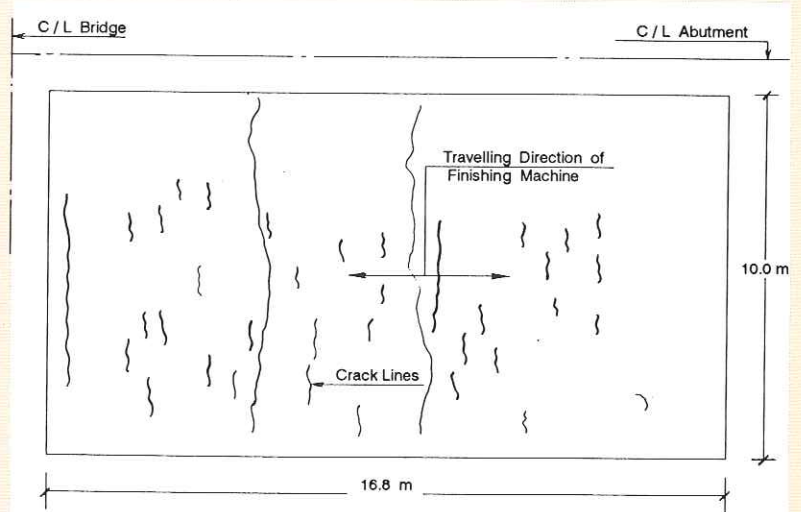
APPROACH SLAB AT STRUCTURE 13 - 2 (NORTH)
